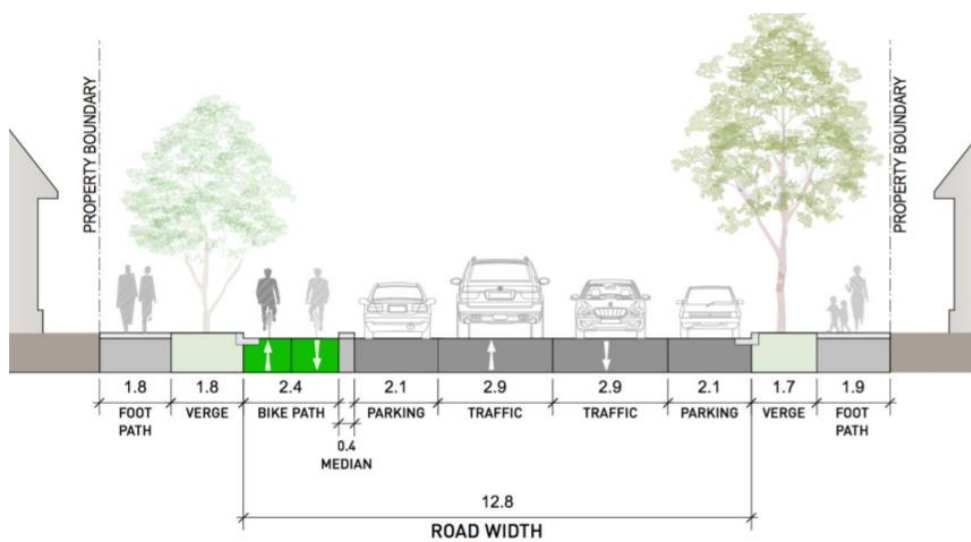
Section showing a 2.4m bi-directional cycle lane in a typical residential street with parking on both sides and two travel lanes. (Source: North Sydney Council)
